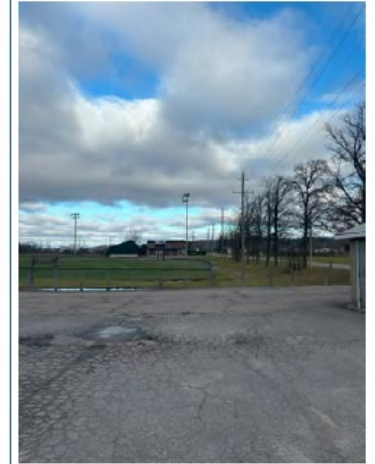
Outdoor Tye Field Light Standards, 6 total, precast concrete poles and metal halide 1,080W luminaires
